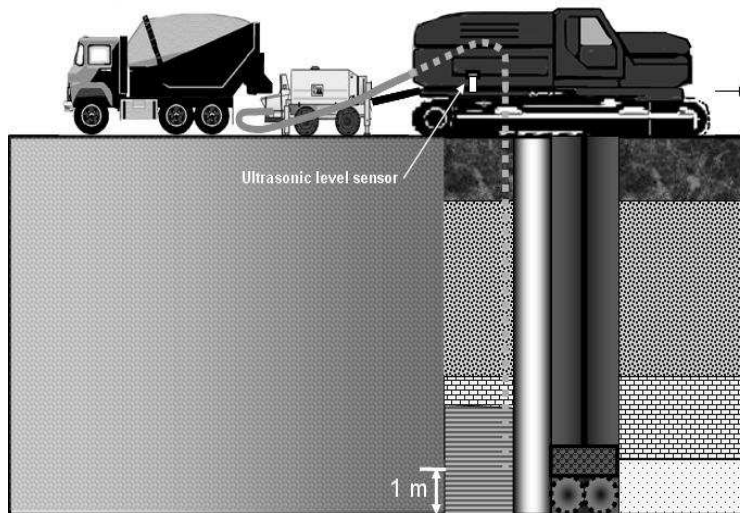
Casting machine with ground digging and SFRC casting elements (SCOUT courtesy)
